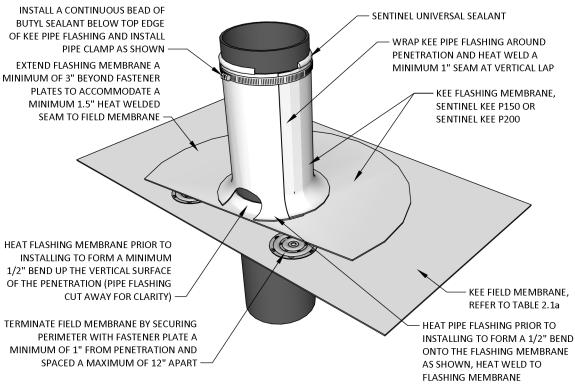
Adhered KEE Field Membrane at Penetration With Field Fabricated Pipe Flashing
